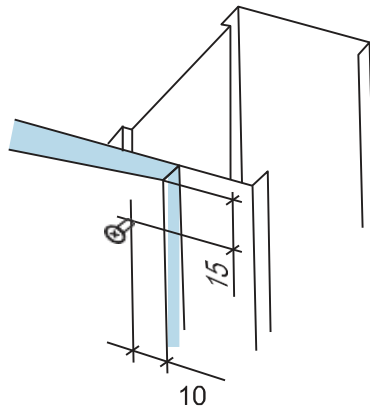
Fixing gypsum boards/gypsum plasterboards to steel section.
